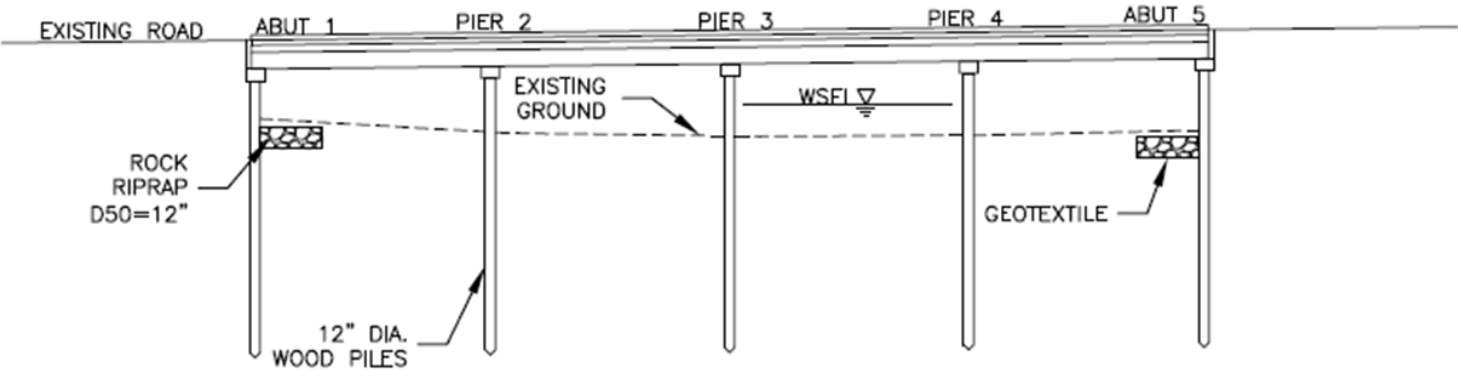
Cross-sectional view of Bridge G-17-AL with recommended hydraulic scour countermeasures
